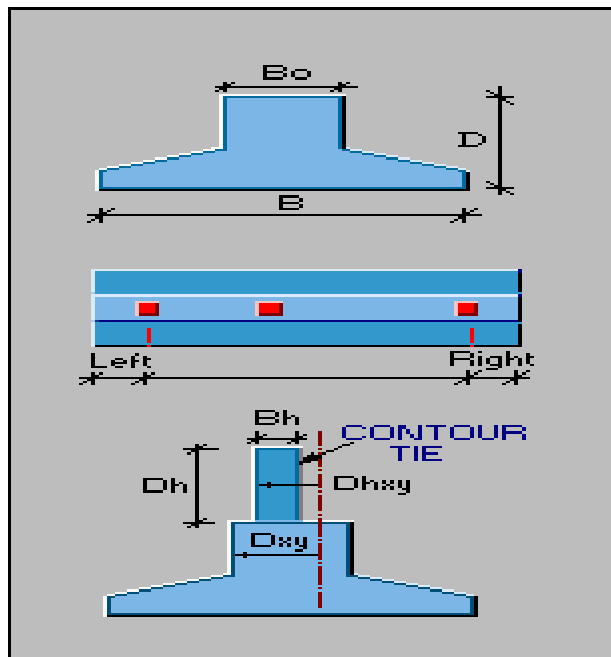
Section of Continuous Foundation (STA4-CAD Handbook)
